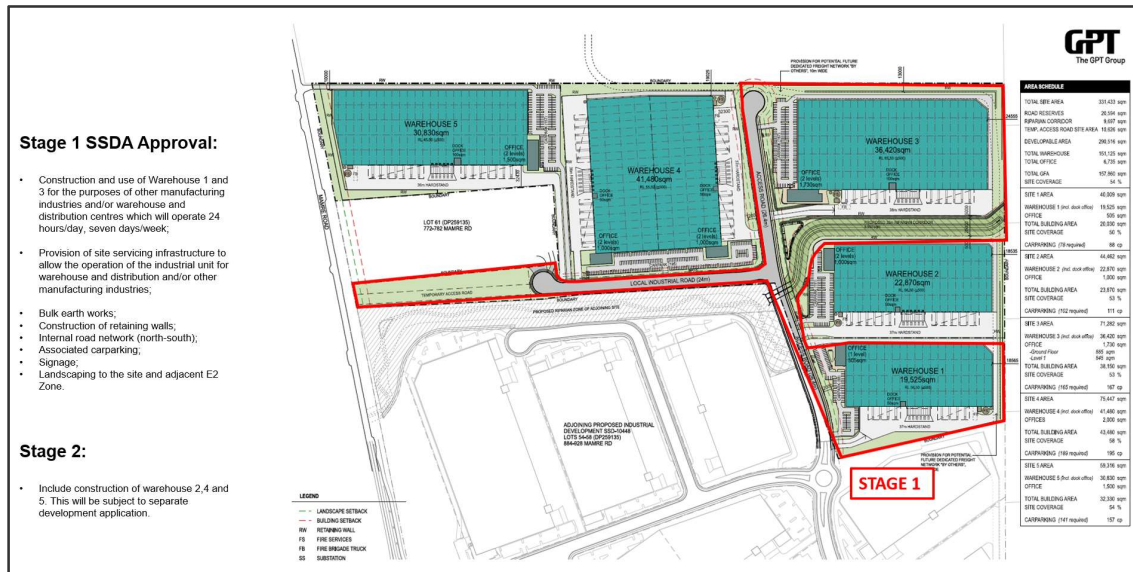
Site Layout Stage 1 (The GPT Group and SB Architects)
